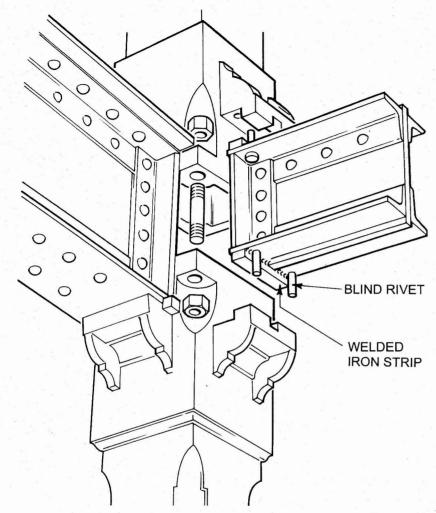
Conjectural drawing showing presumed method of fixing the joint (Jonathan Clarke).
